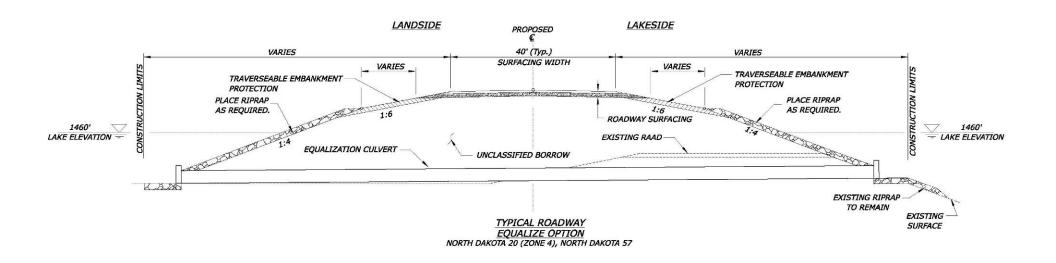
Typical Section for Equalizing ND 20 (Zone 4) and ND 57
